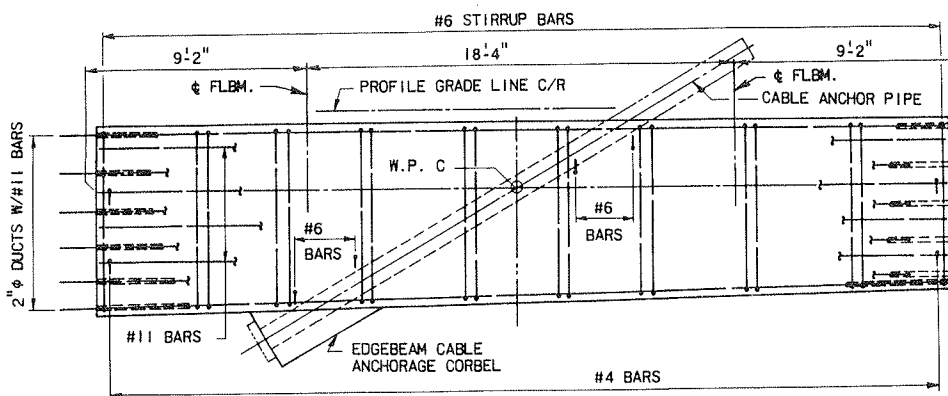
Concrete alternative: edge beam reinforcing details.
